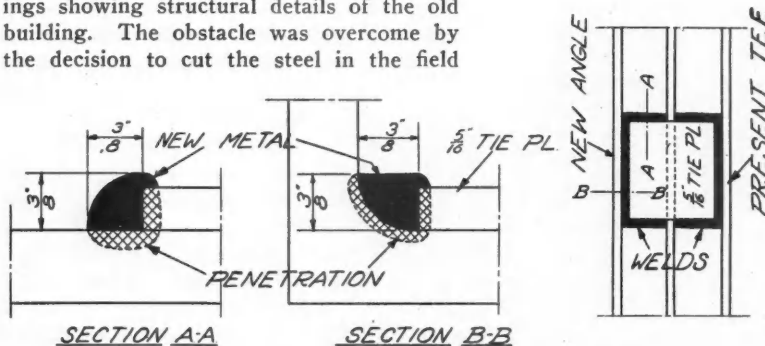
Details of Welded Connection of Tie Plates to Old Columns and New Reinforcements.
